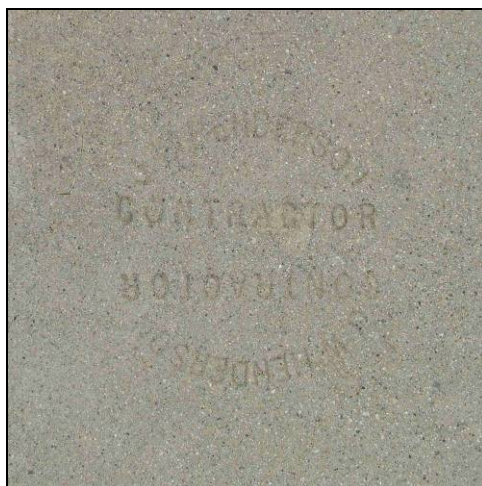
(right) View looking north at a newer section of a concrete sidewalk on the west side of Cottage Grove Avenue
